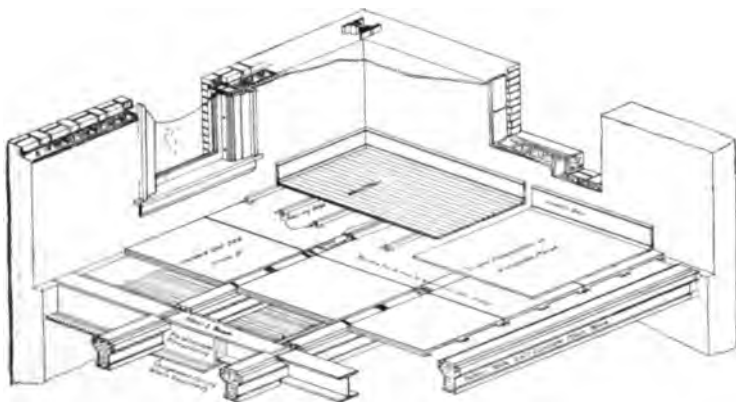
GENERAL TYPE OF UNIT CONCRETE MEMBERS.
